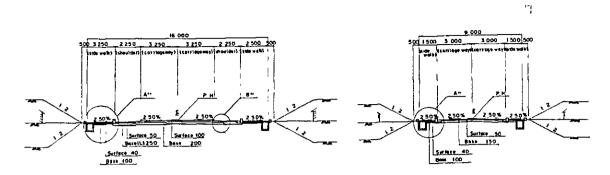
Typical Cross Section of T-5, R-1 & R-2
